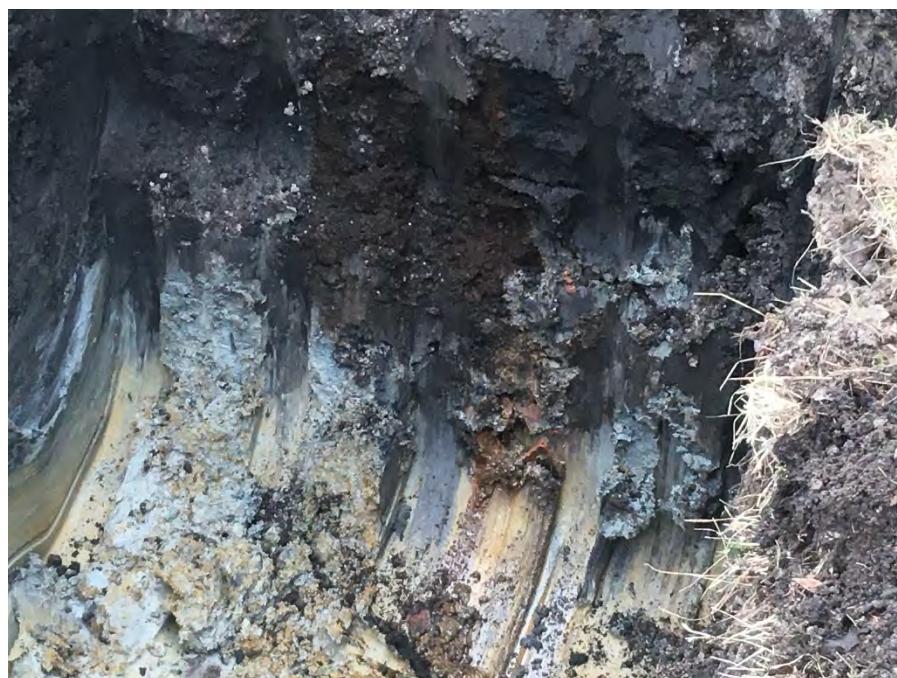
Excavation of manway shown in photos 2 and 3, showing crushed tile that extended offsite toward the SE (facing SE). Wooden box culvert also found trending NE of manway (not shown).
